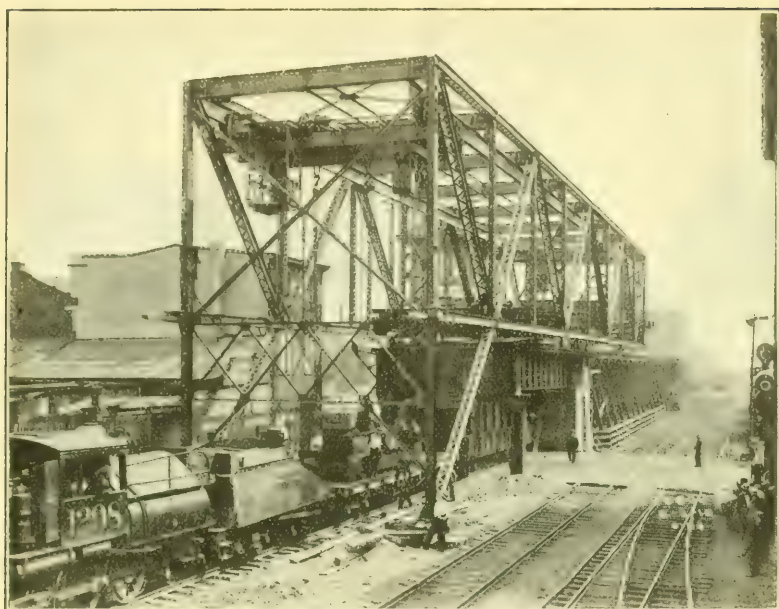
TRAVELER STARTING ERECTION OF VIADUCT.
